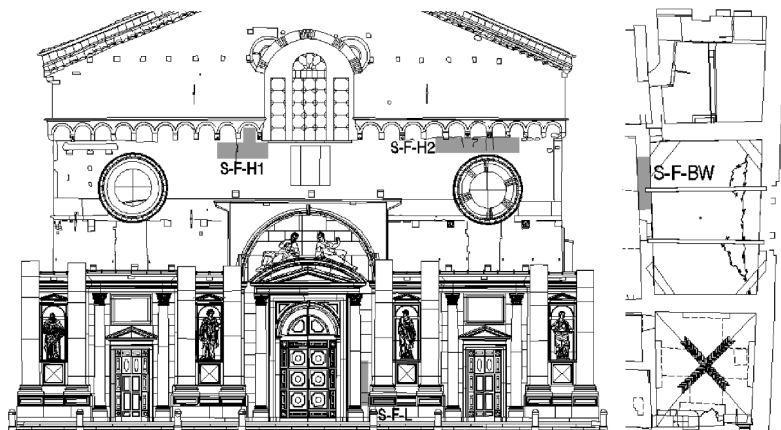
Positioning of sonic direct tests, façade (elevation) and dome lantern back wall (plan view).
